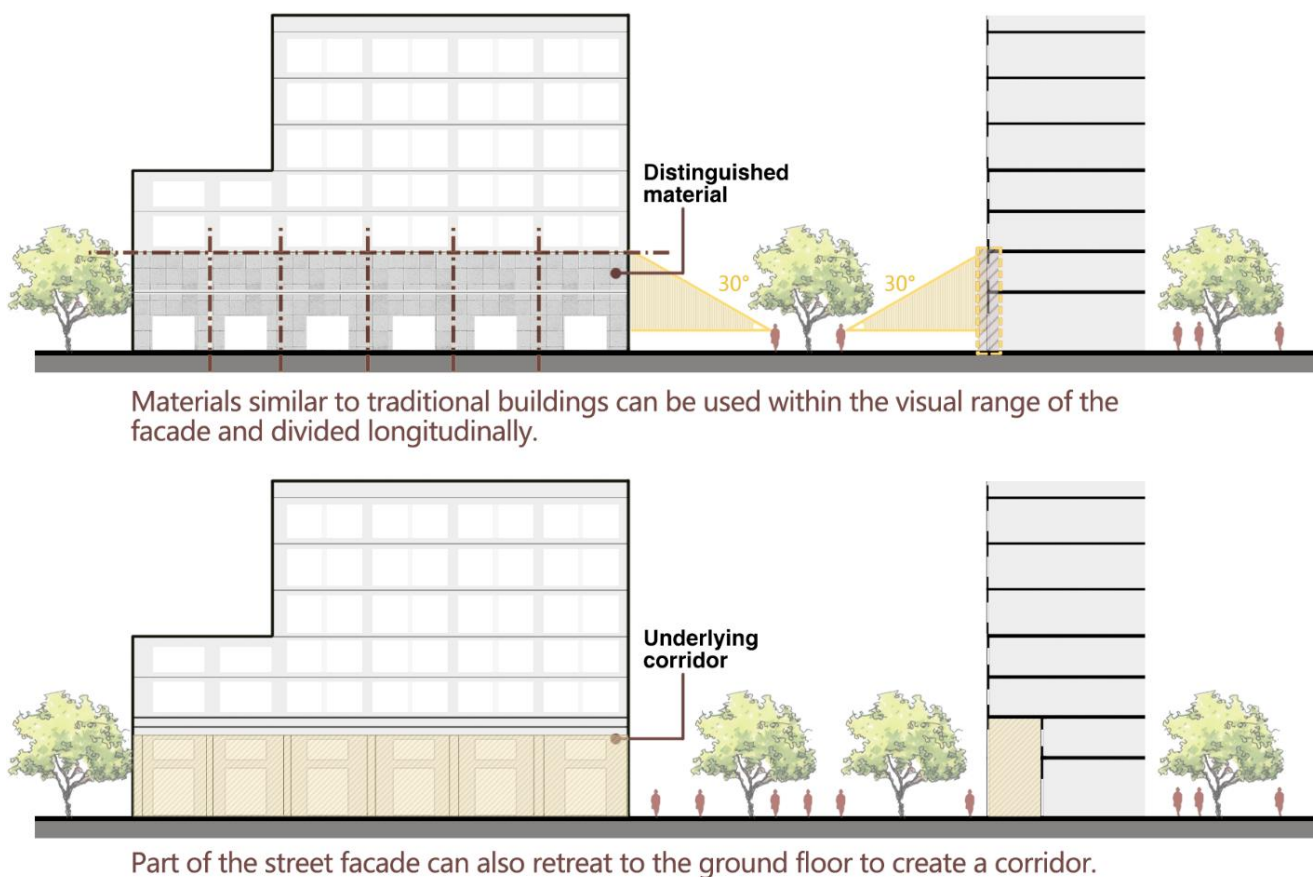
Detailed rules of building intervention for T4 (Source: the author)
